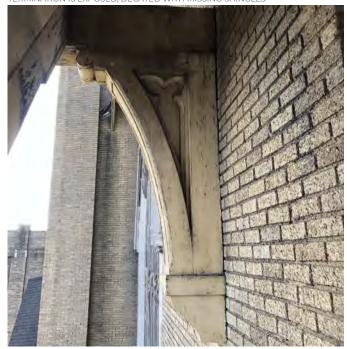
WEATHERED, FADED EAVES; RUSTED GUTTER (EAST ELEVATION)
